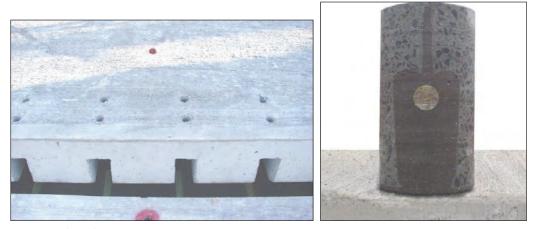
(left) Dowel receptacles and grout holes; (right) grouted receptacle with dowel (Thomas 2008).
